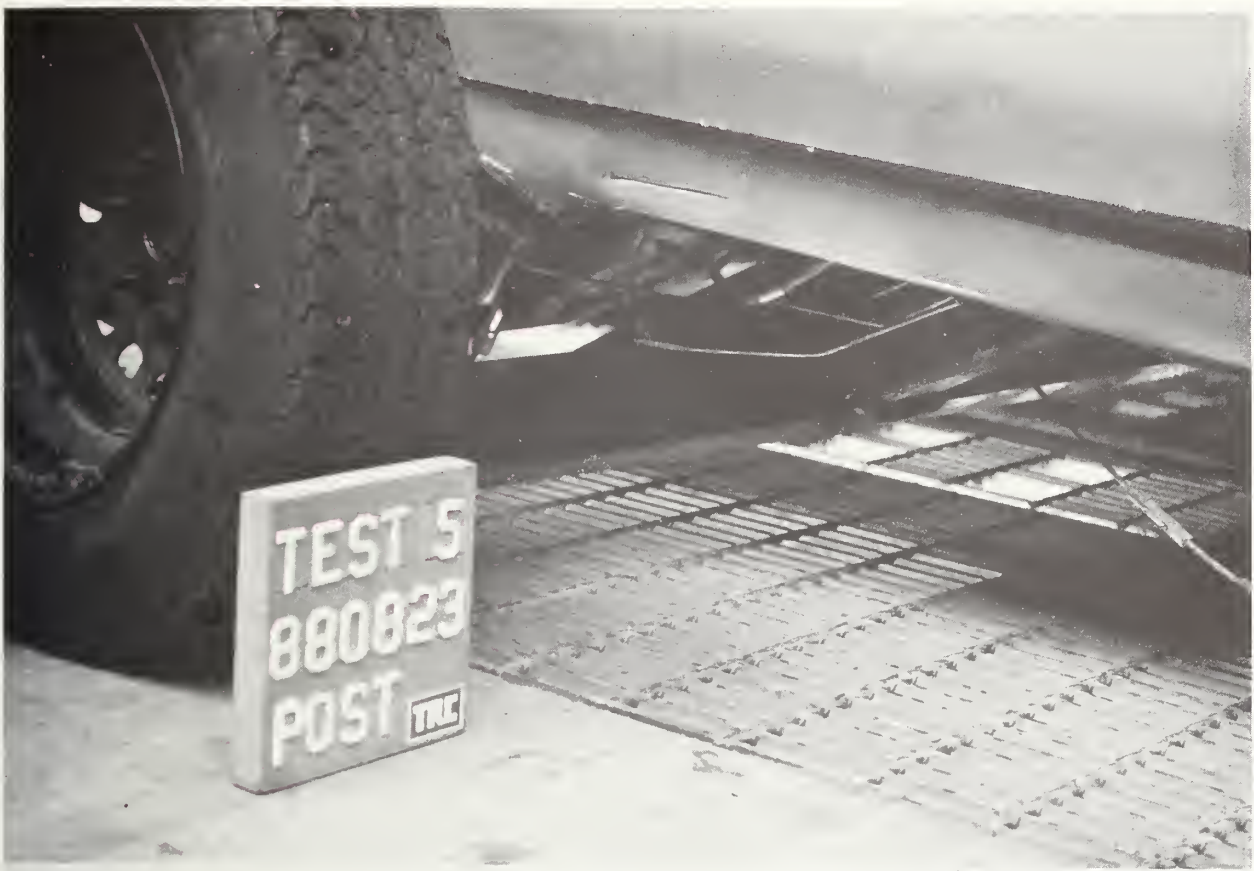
POST-TEST CLOSEUP - VIEW 8
